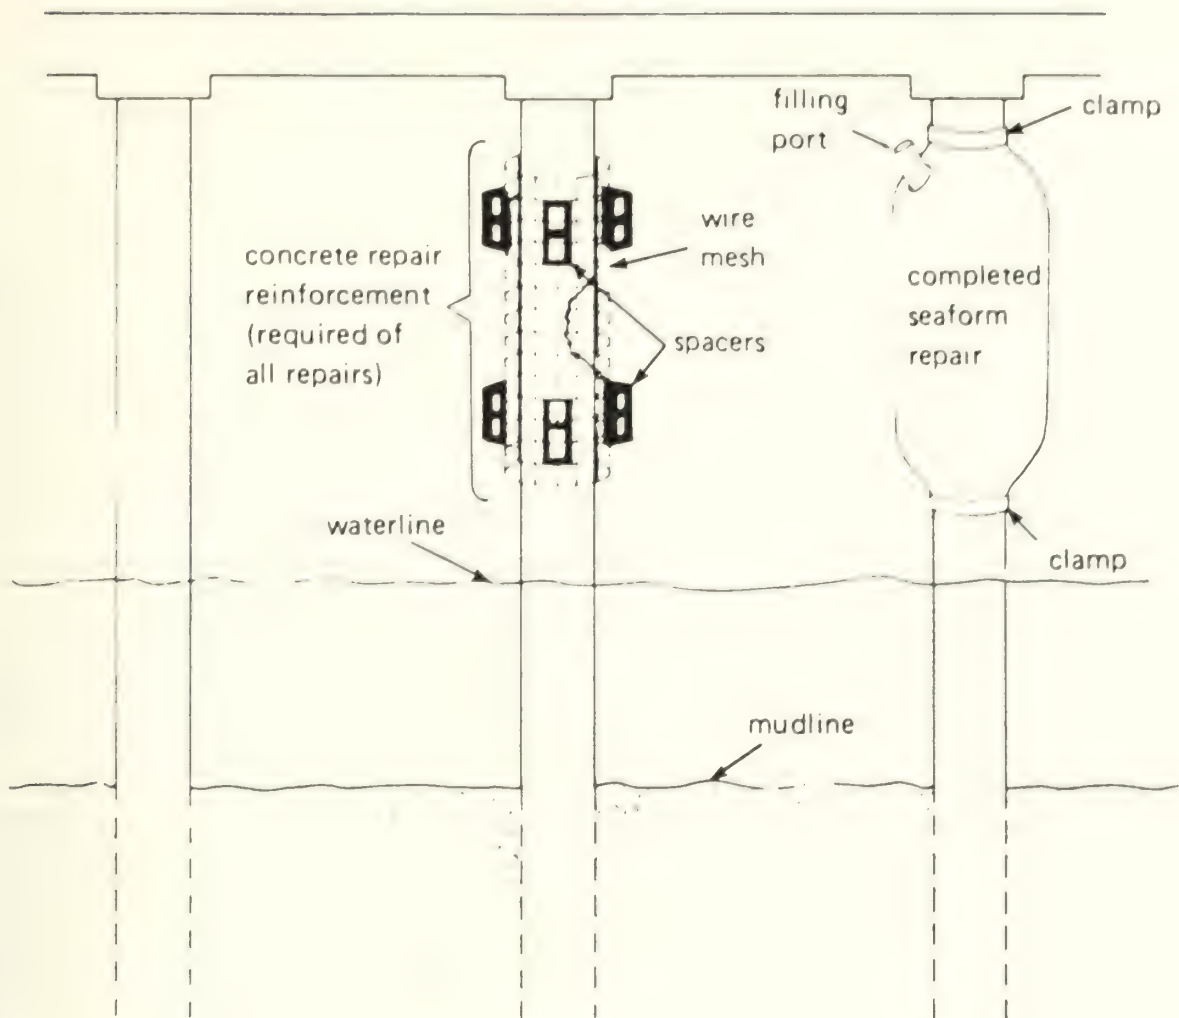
"Seaform" Repair Technique for Concrete Encasement
